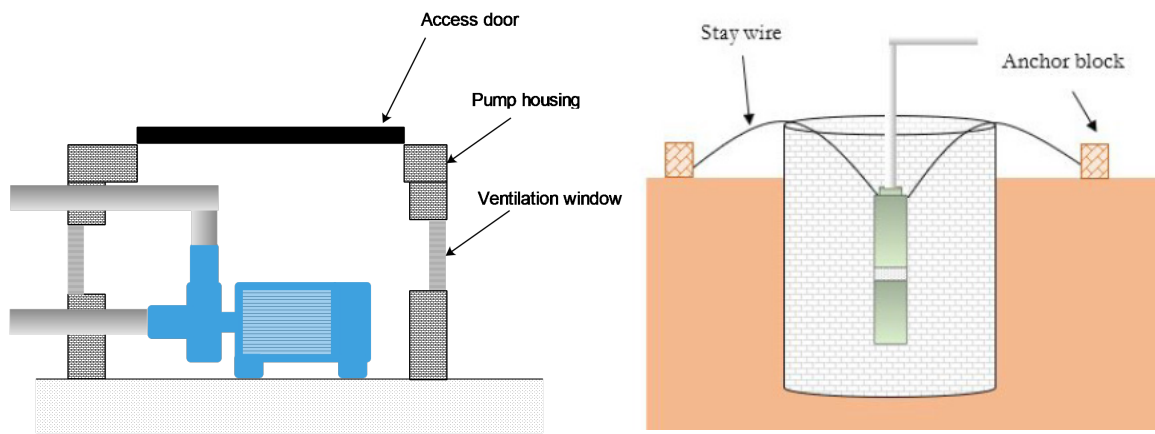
Installation of Surface Pump in pump housing (left) and Submersible Pump fastened with stay wire (right)
